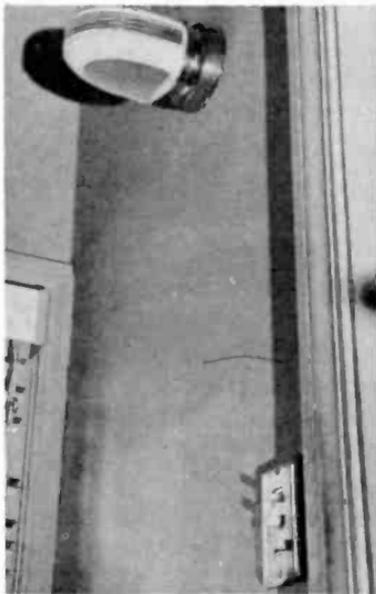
A back-hall single-light switch was changed to three switches: one for the original hall light; one for the outside floodlight; and a three-way switch for the garage.
